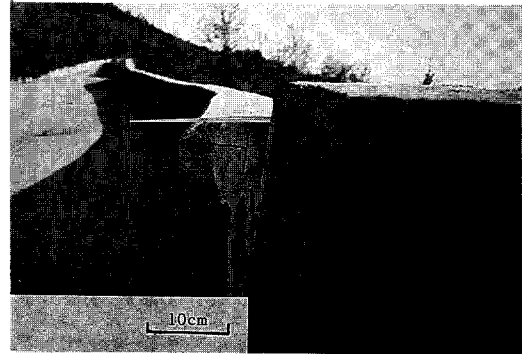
Movement of retaining wall on rockslide area on 1990. Level monument L 1-2 is located at the top of this retaining wall.
